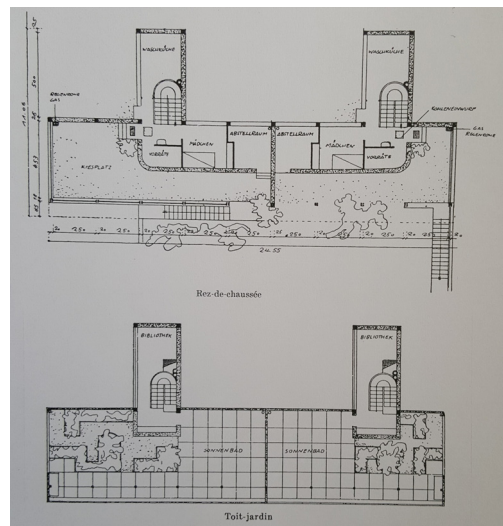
1st. floor and roof garden plans of the Stuttgart house[13] pp. 154-155.
